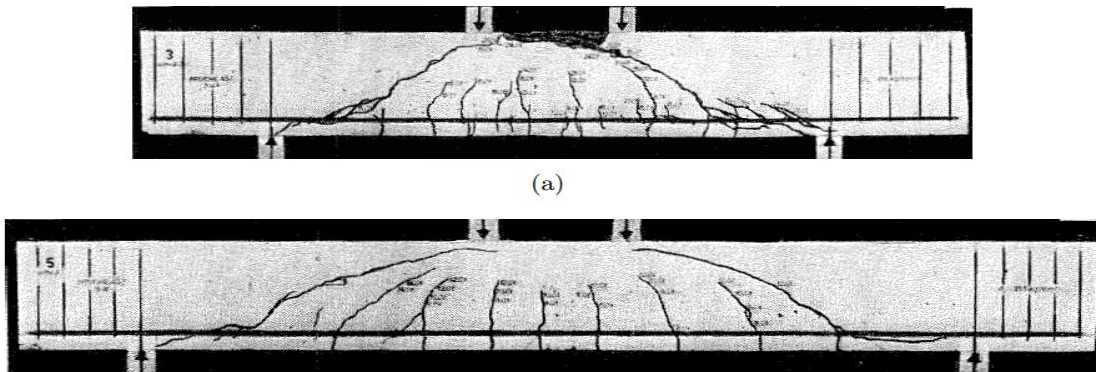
Crack patterns observed on beams (Leonhardt and Walter, 1962)
